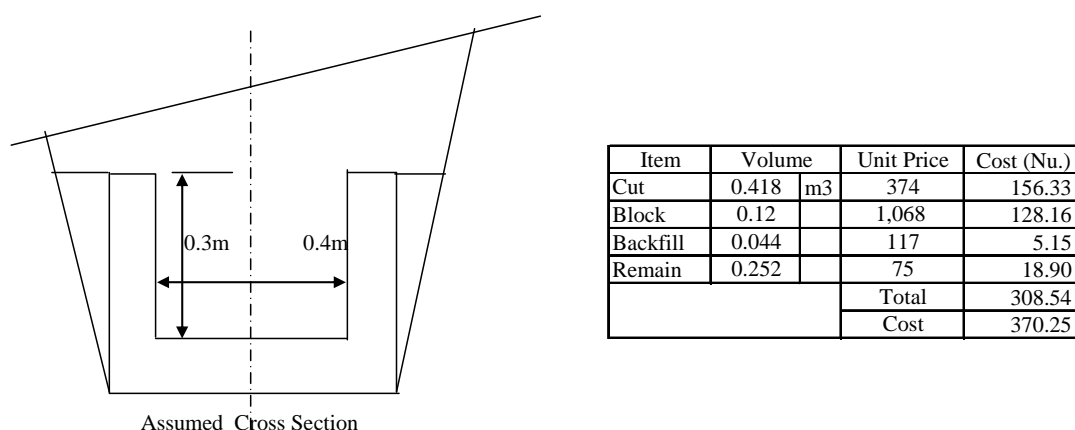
Typical Canal Cross Section and Construction Cost
